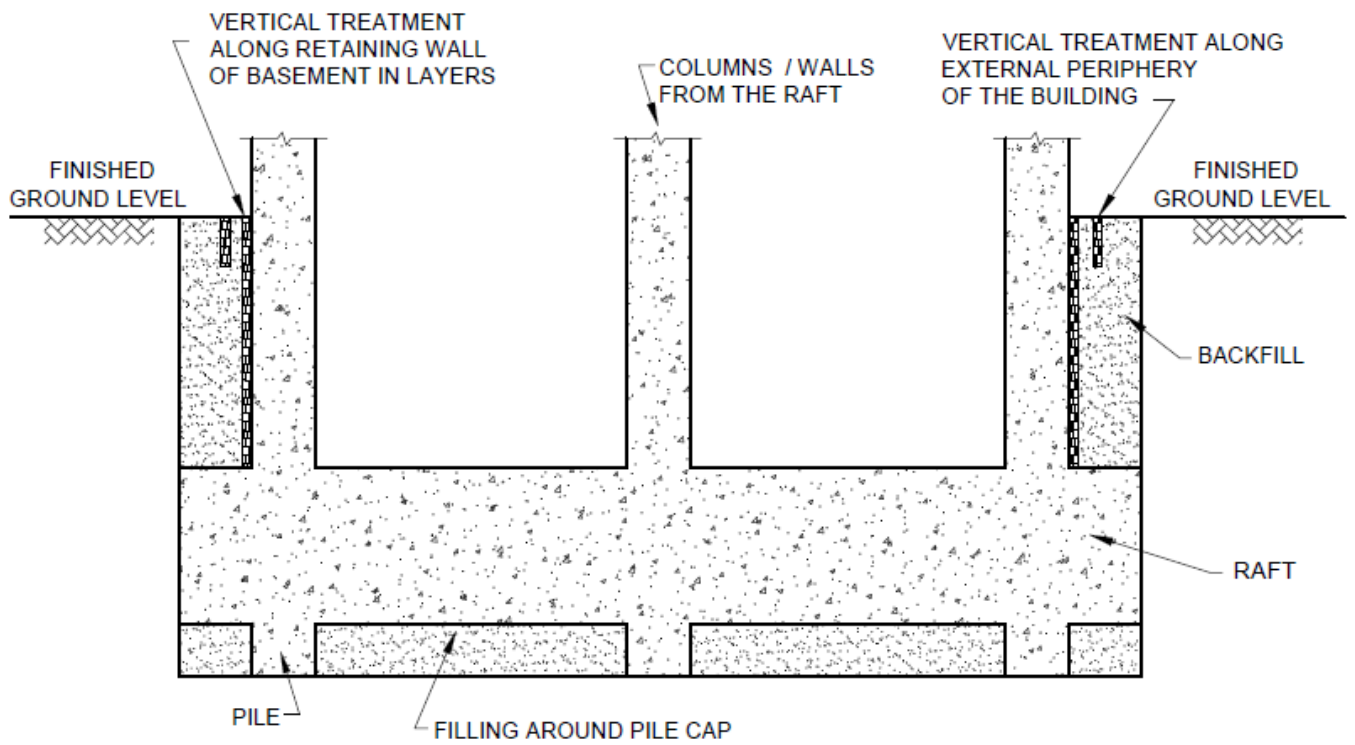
TREATMENT FOR SHALLOW BASEMENT WITH PILE FOUNDATION
